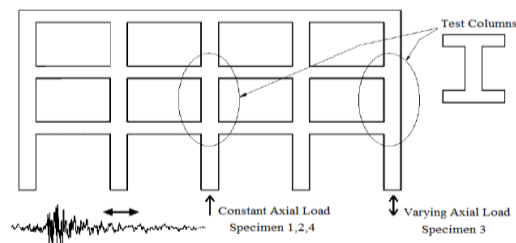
Idealized building frame subjected to lateral earthquake and gravity loads [1]
